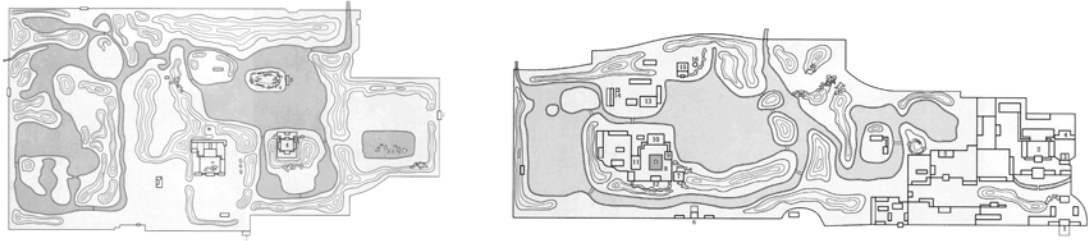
12 The Plan of Shuchun Garden and Minghe Garden
